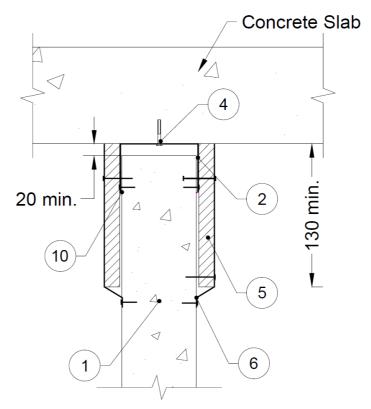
Head Detail A – Fire Grade Plasterboard Each Side (Section View)
